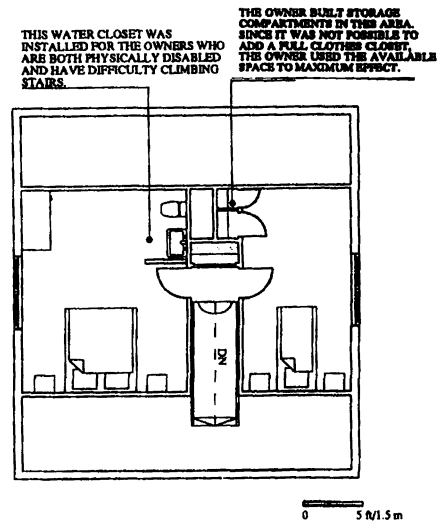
Upper-floor plan of case study 13: Additional water closet.
